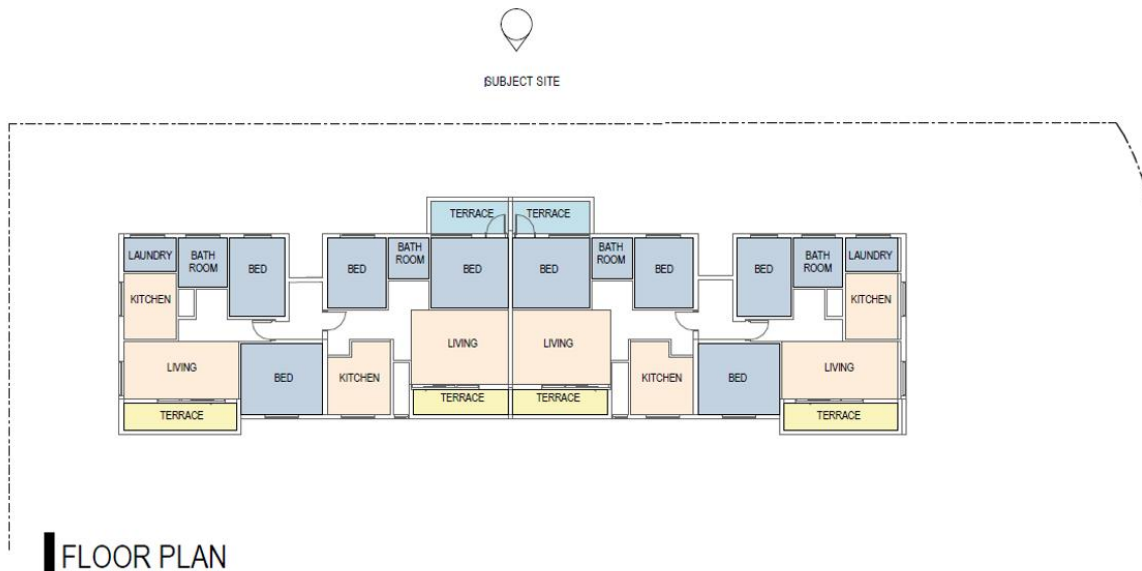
Extract from the Elevational Shadow Diagrams of 21 Lachlan Avenue (which adjoins the subject site to the south) which demonstrates that the living rooms and terraces of these apartments are on the south-western façade (not facing the subject site).
